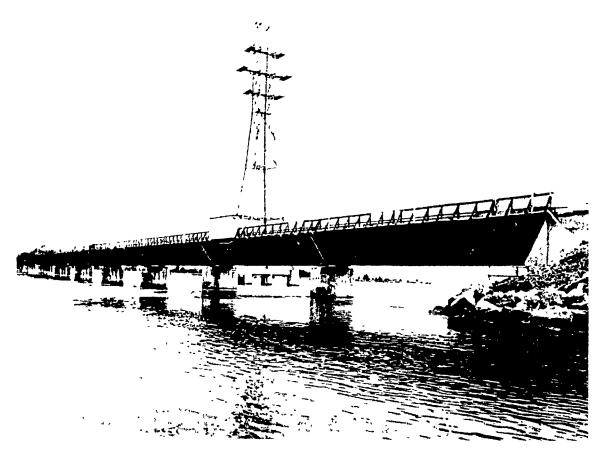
GENERAL VIEW OF BRIDGE AFTER REPAIRS
